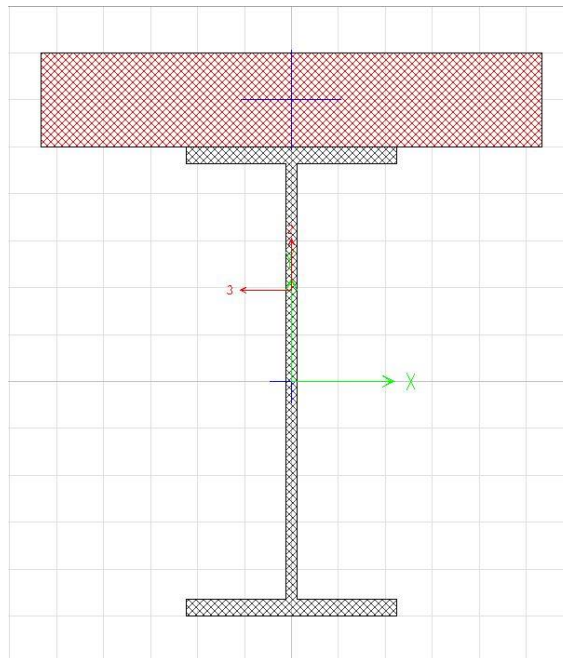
Composite beam, B15x42 with modified unreinforced concrete
